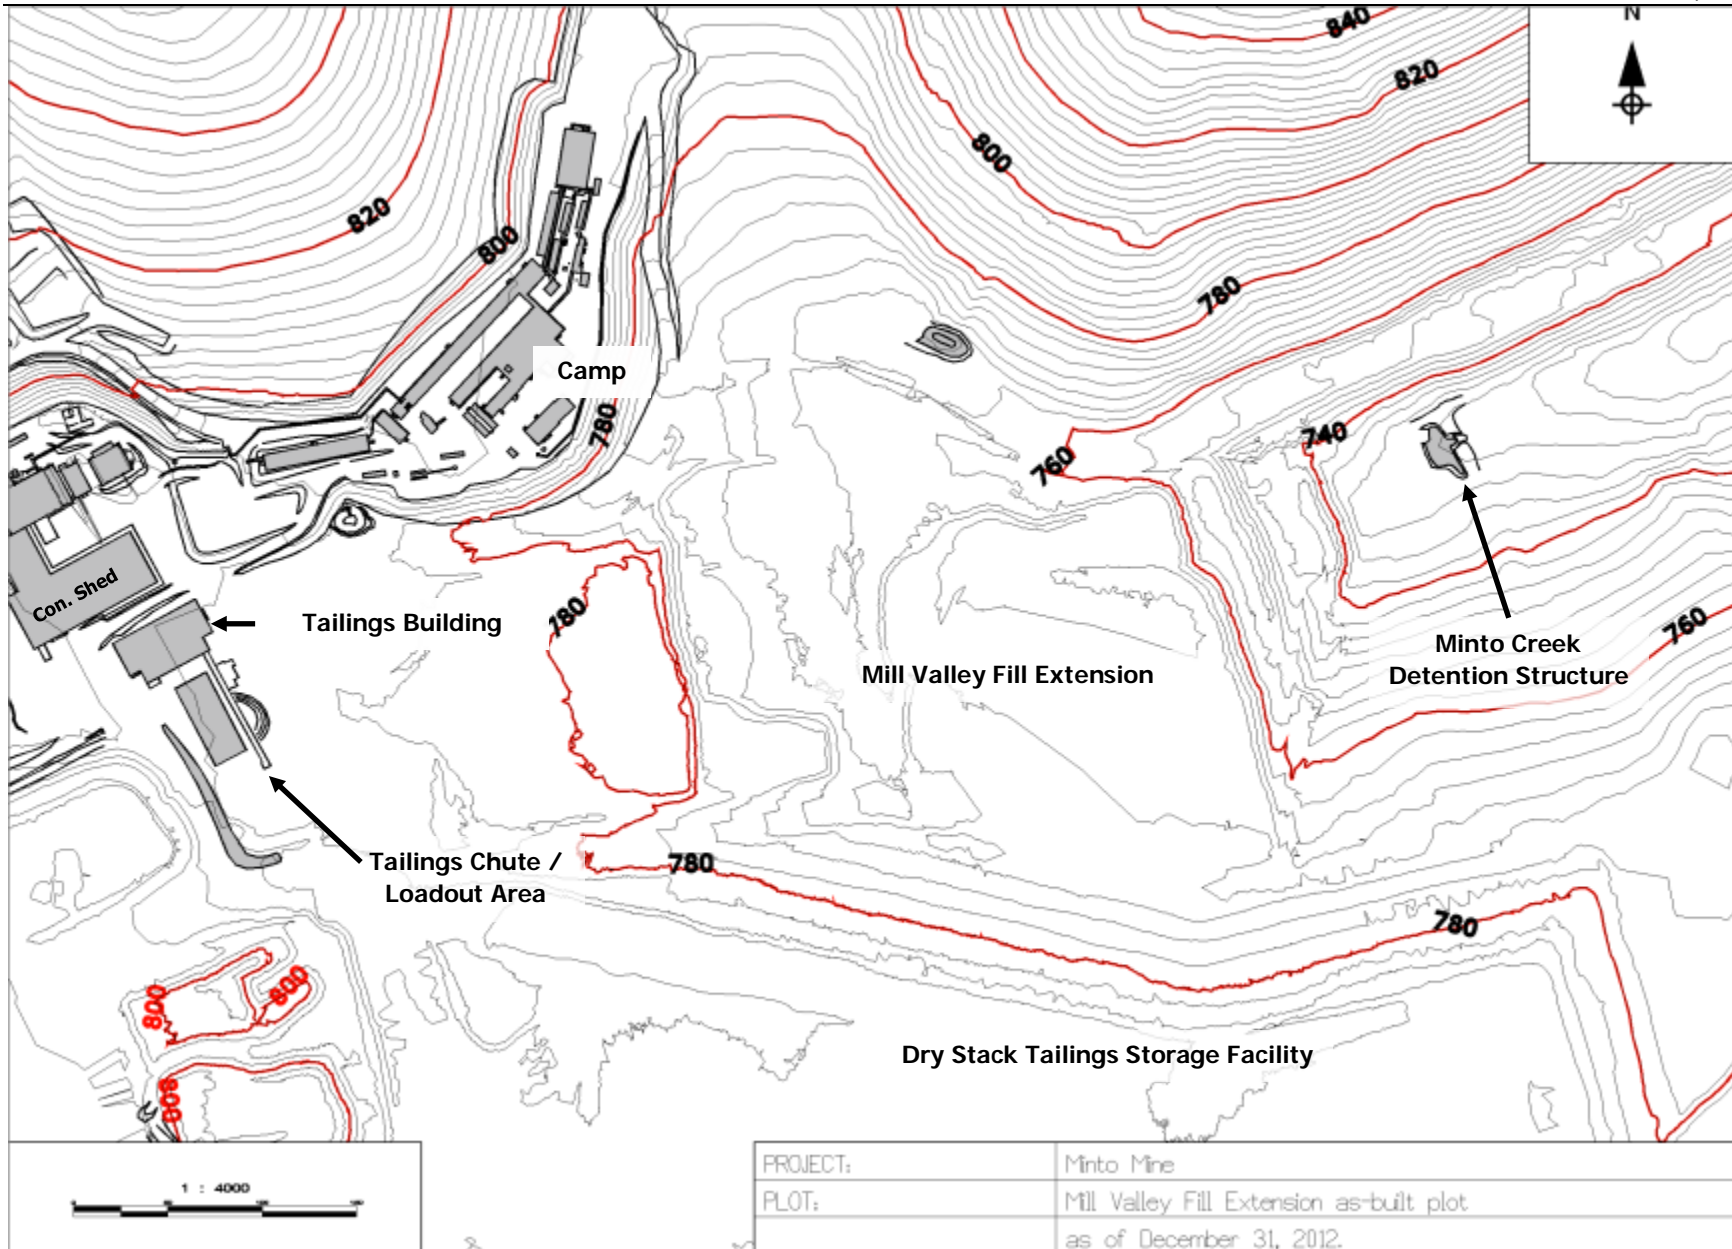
As-built drawing of the Mill Valley Fill Extension construction as of December 31, 2012.
